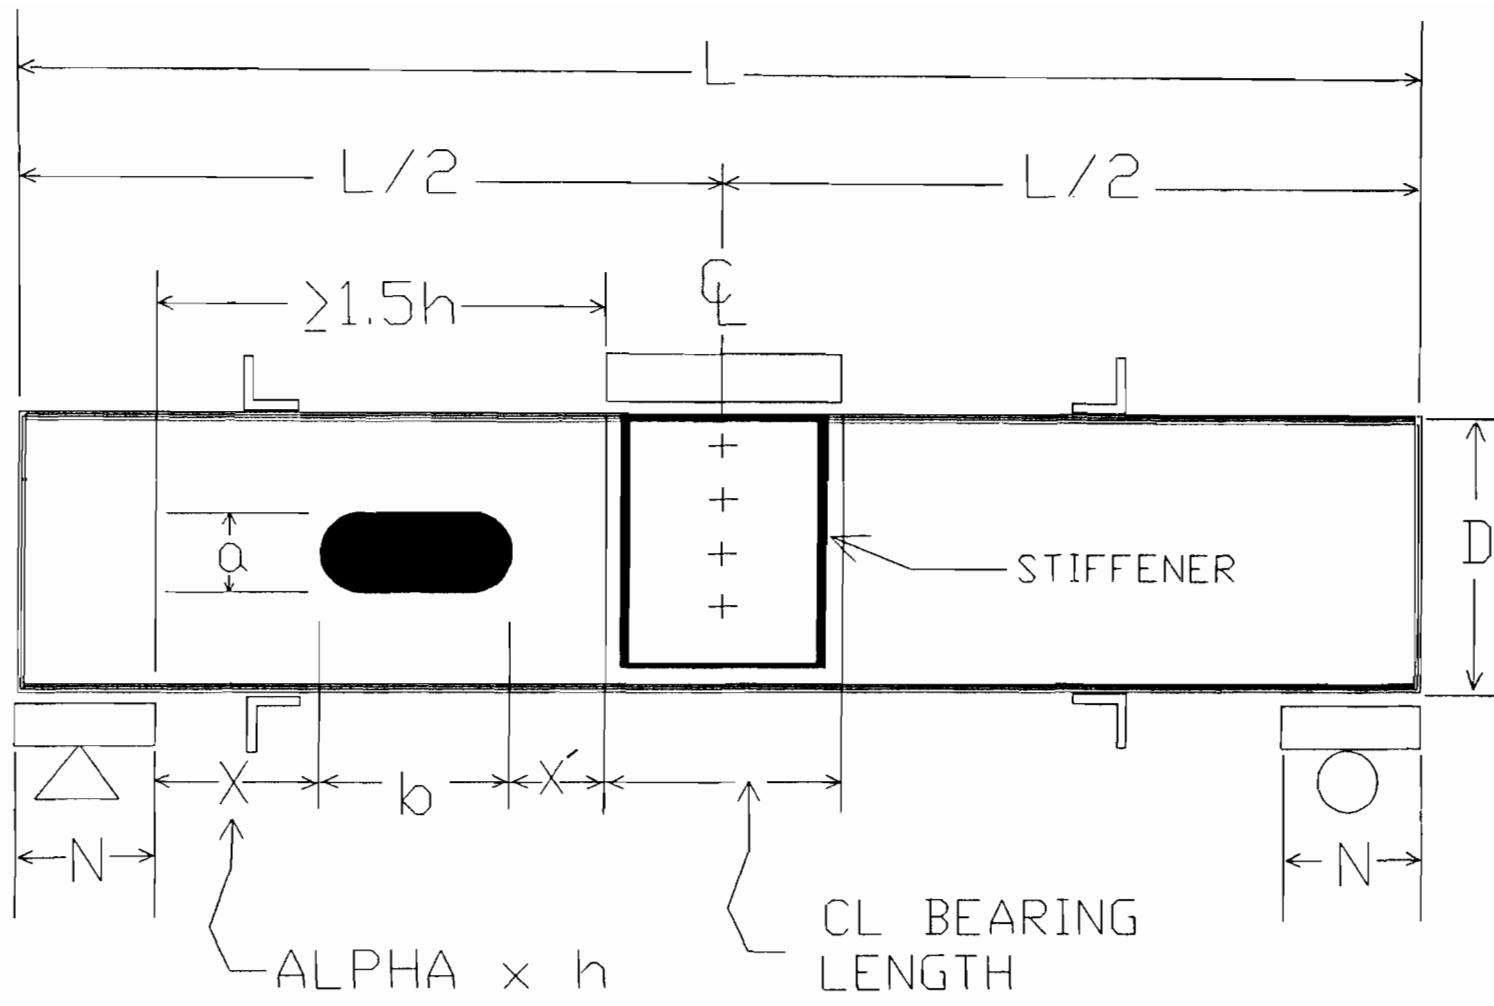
SPECIMEN PARAMETERS LONGITUDINAL VIEW
